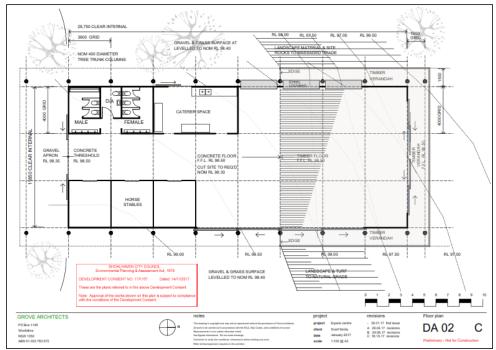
Approved floor plan of Equine Centre from DA17/1157
